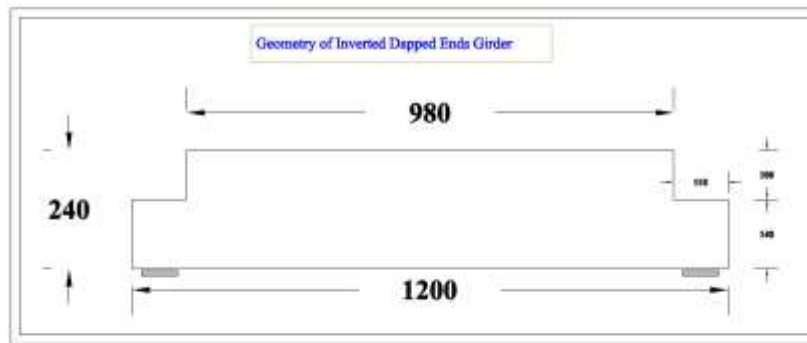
R.C. Inverted dapped-ends girders layout and dimensions (mm).
